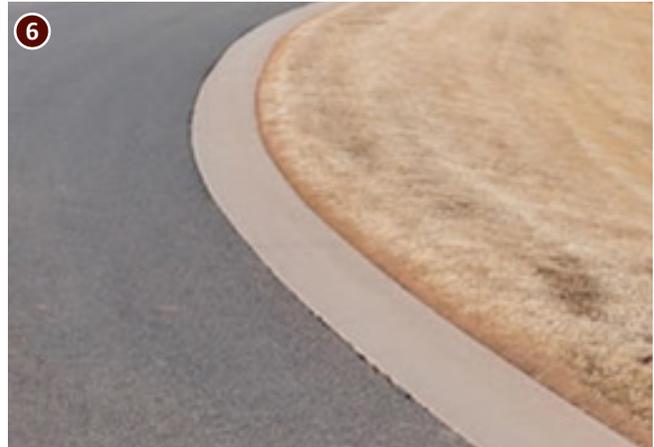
Rolled Concrete Apron (Specify Concrete)
